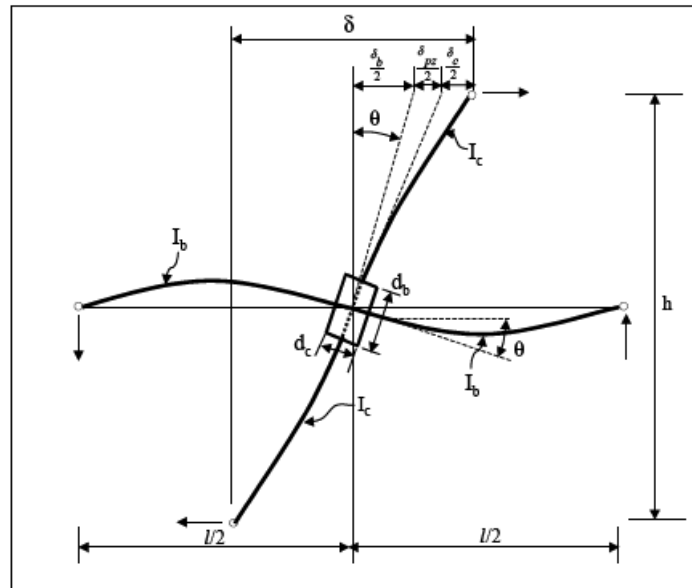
Equivalent building drifts (Gupta and Krawinkler (2002))
